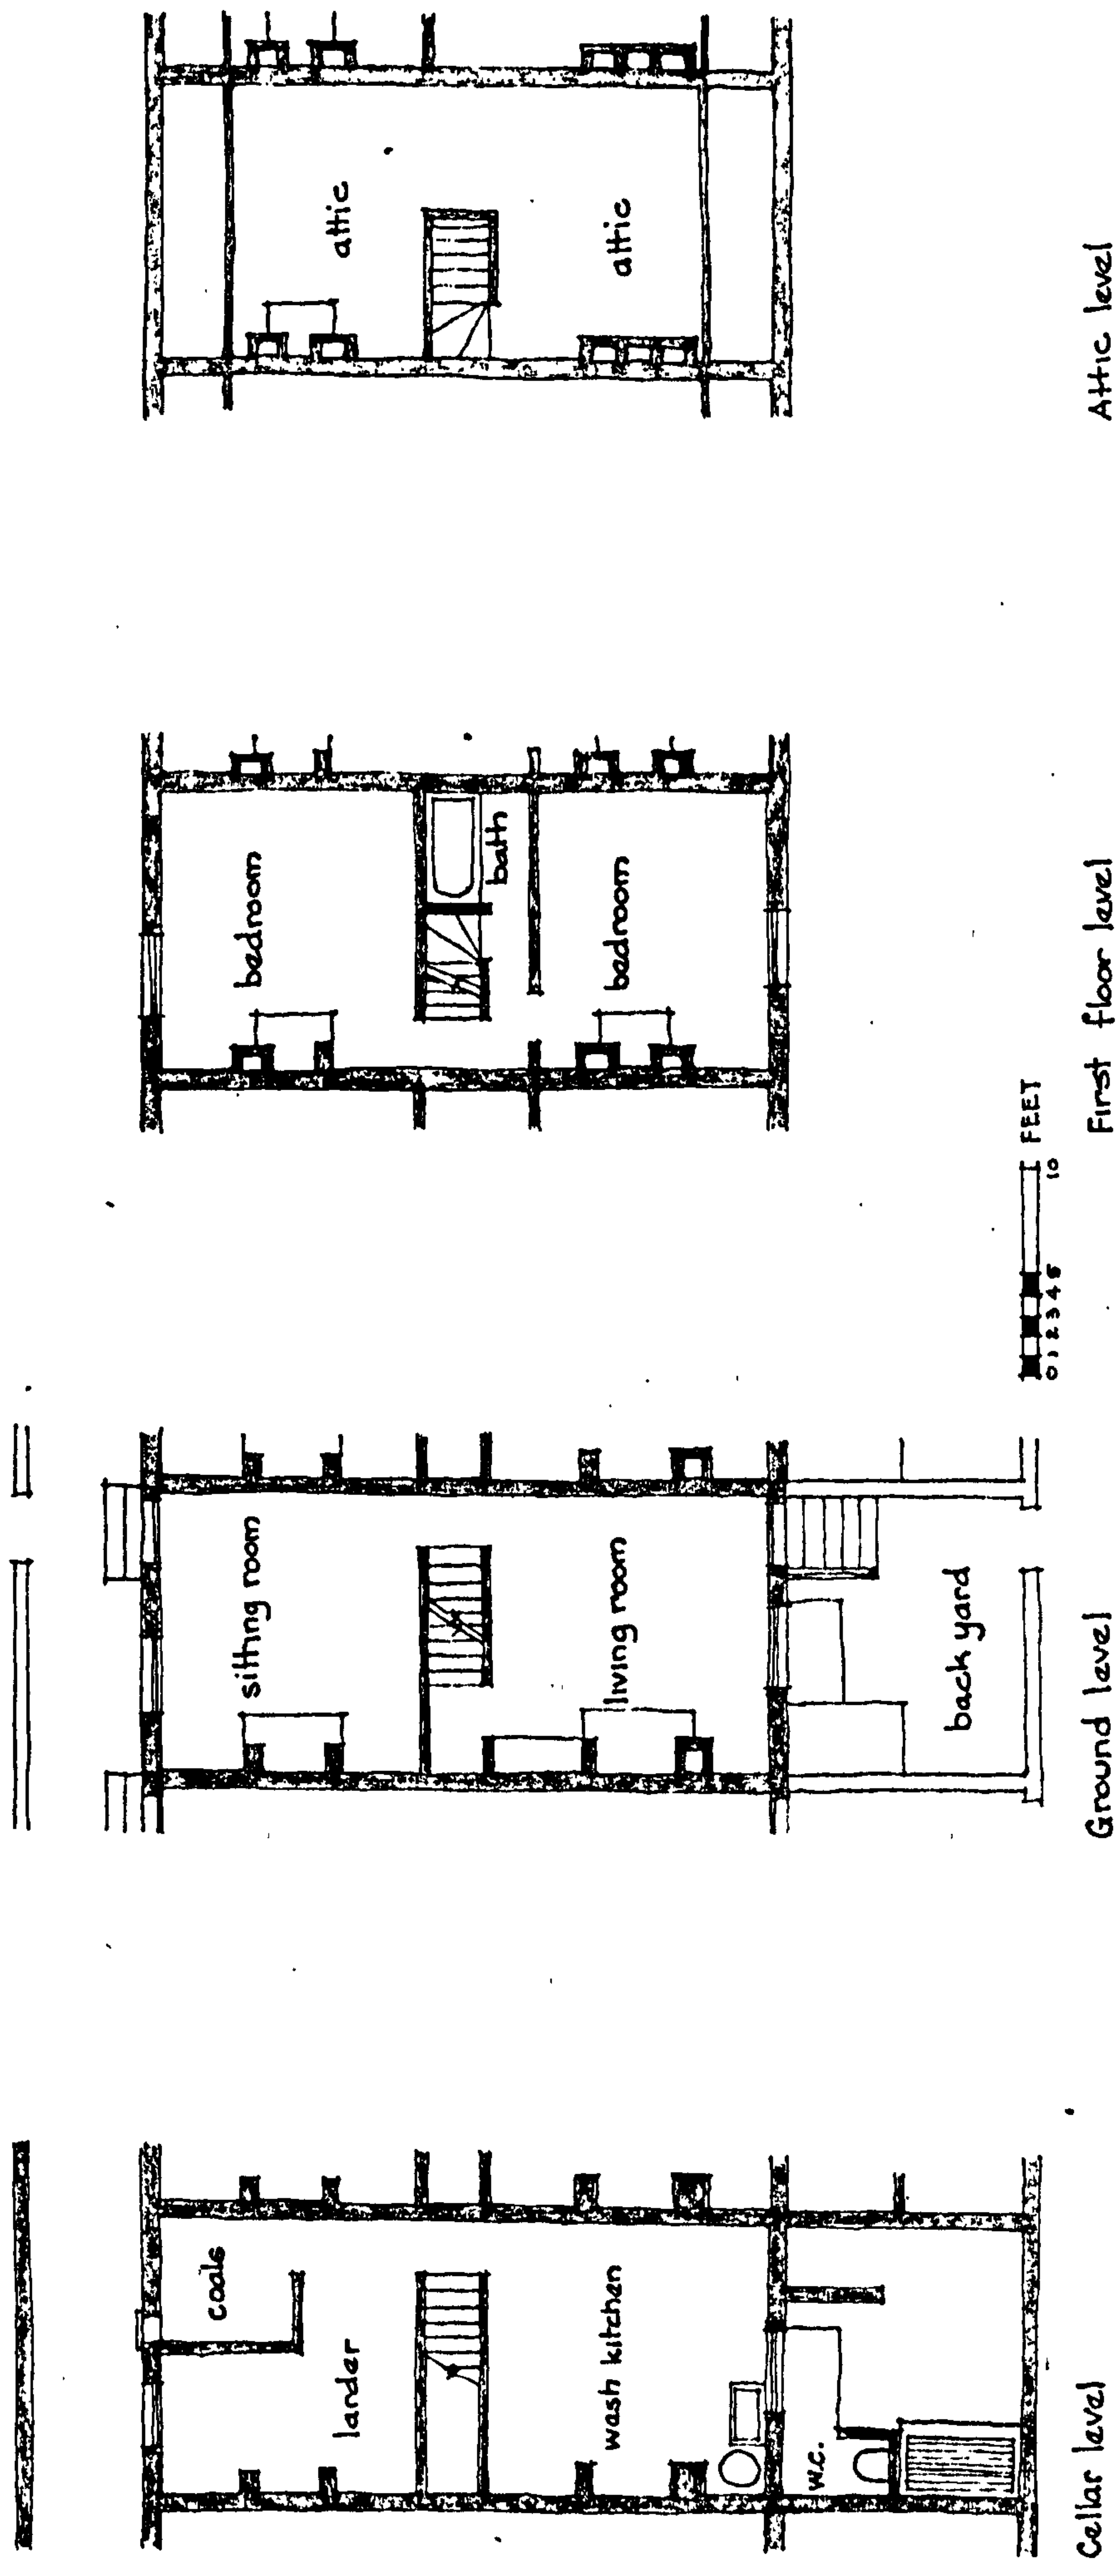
Floor plans of a typical small through dwelling erected in the study area (E. Wilson 1894).
